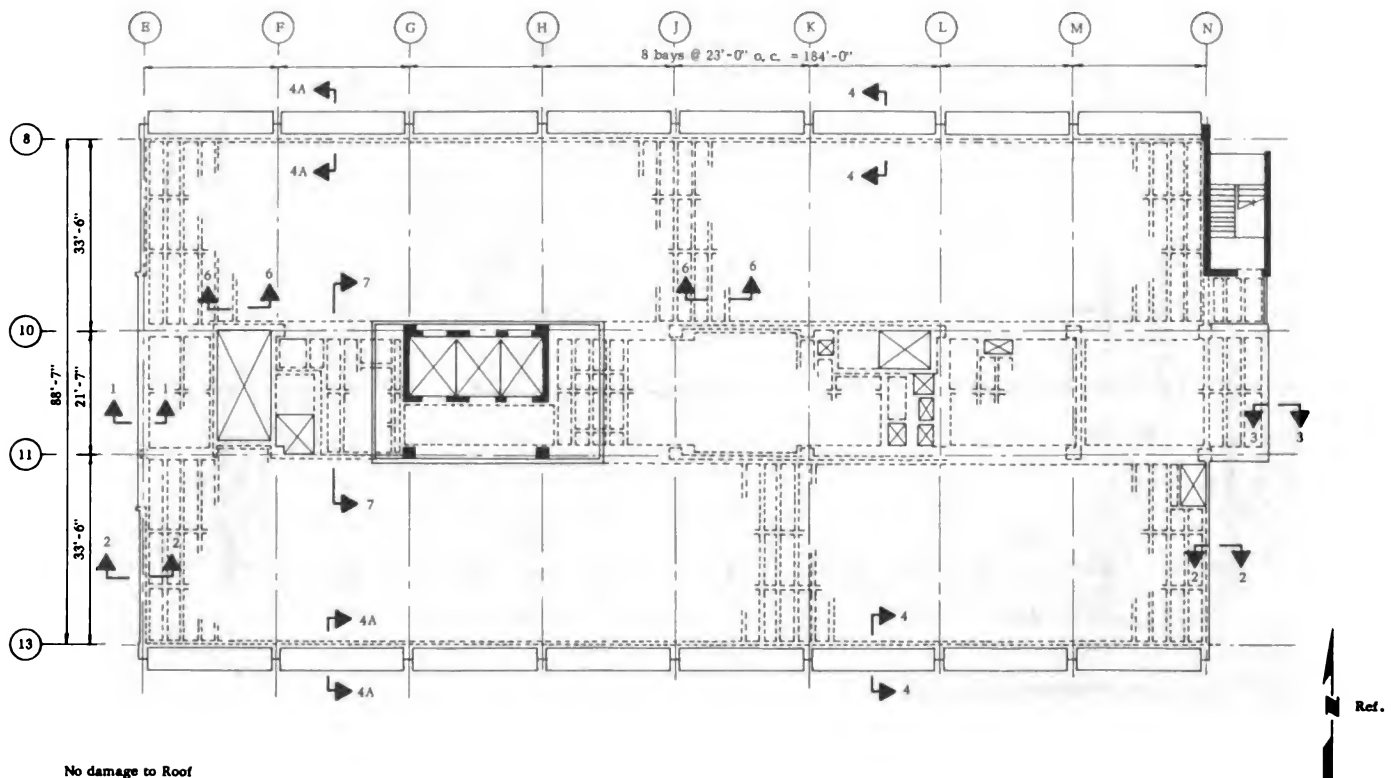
Holy Cross Hospital. Roof framing plan (7-story tower).
